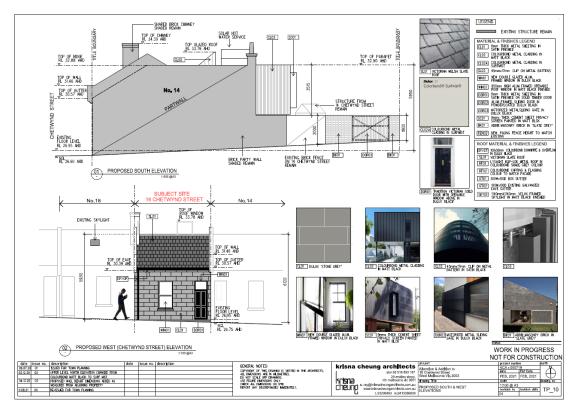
Elevations (source: Krisna Cheung Architects Pty Ltd)
